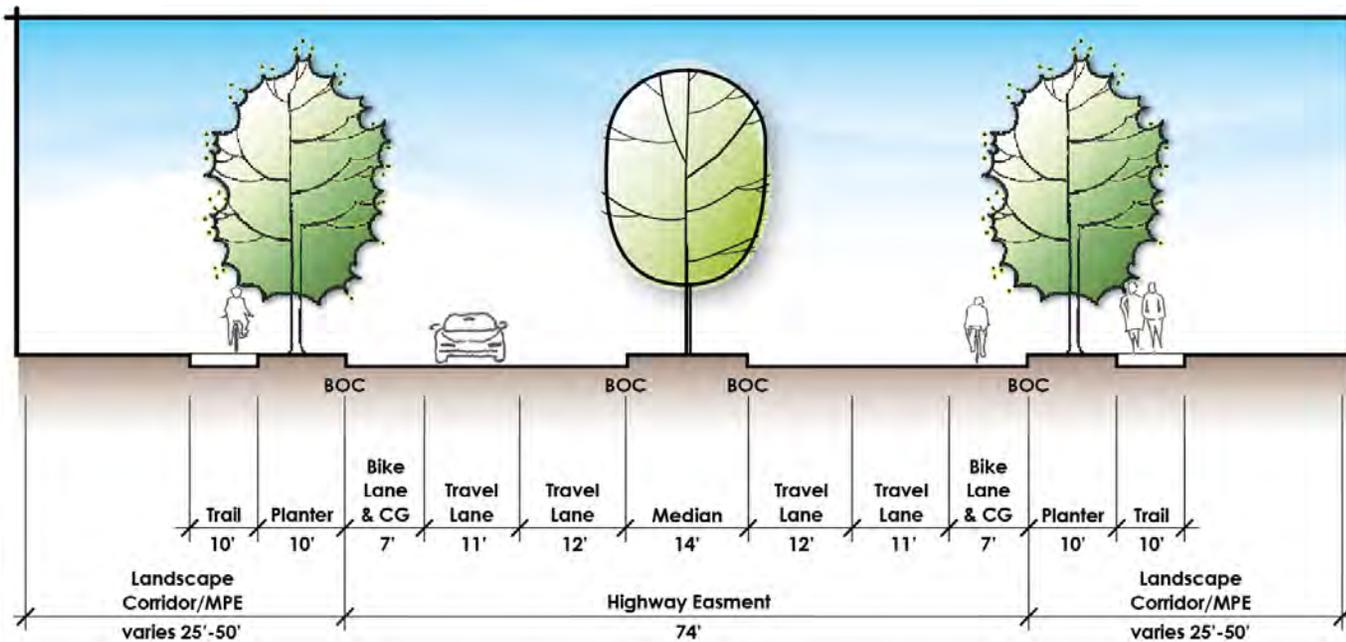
4-LANE ARTERIAL (SUNSET BOULEVARD, CAMPUS PARK BOULEVARD & UNIVERSITY VILLAGE DRIVE)
